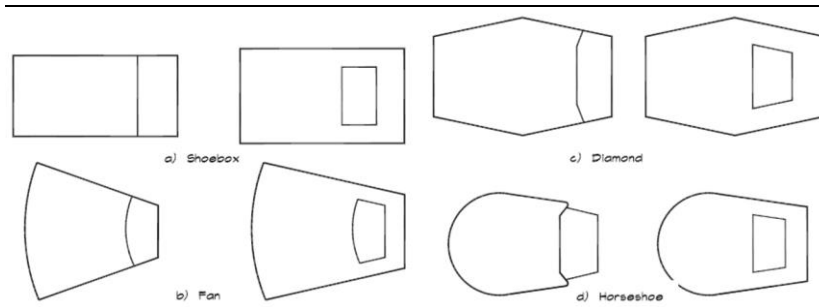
Simple Plan Forms for Rooms [2, p:659]
